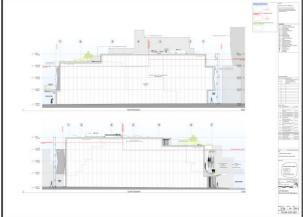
Approved front and rear elevations. Durbach Block Jaggers, 2023
